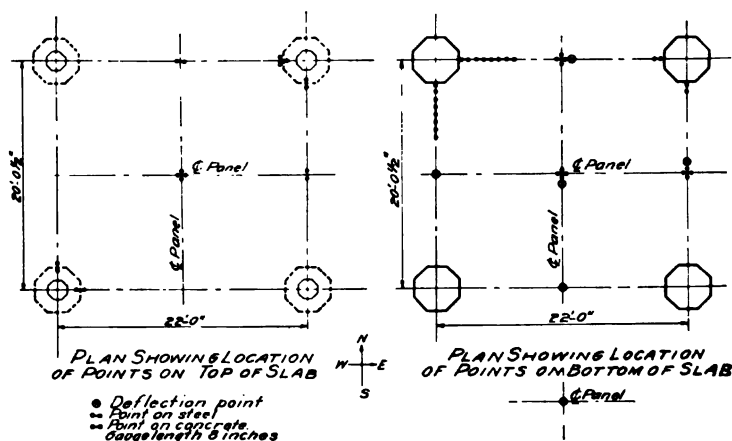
LOCATION OF GAUGE POINTS, CARLETON BUILDING.
